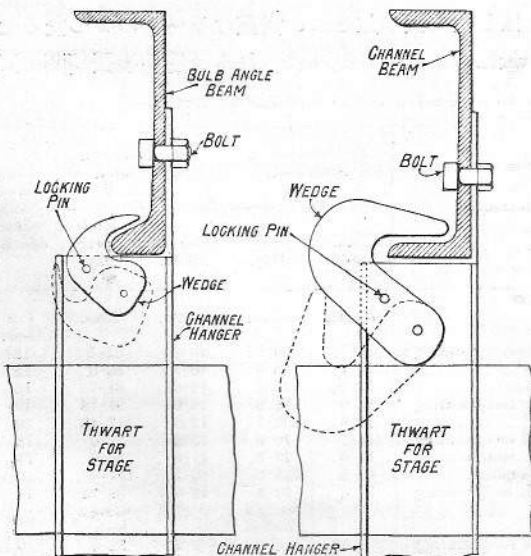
Two Forms of Hanging Stage with Hinged Wedge and Locking Pin.
